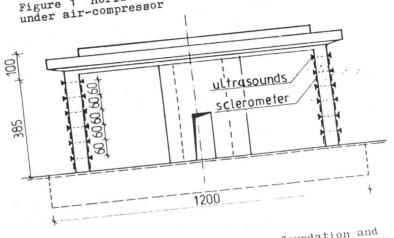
Vertical section of this foundation and measurement places to non-destructive testing
